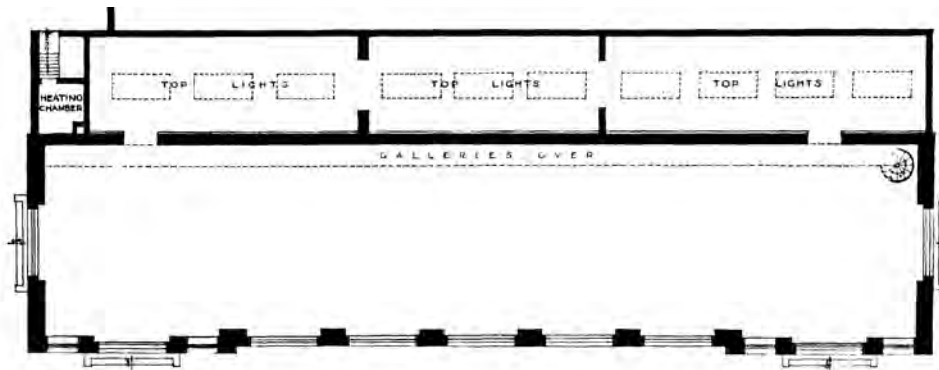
Ground Floor Plan showing the Annexe on north wall, dated October 1927
